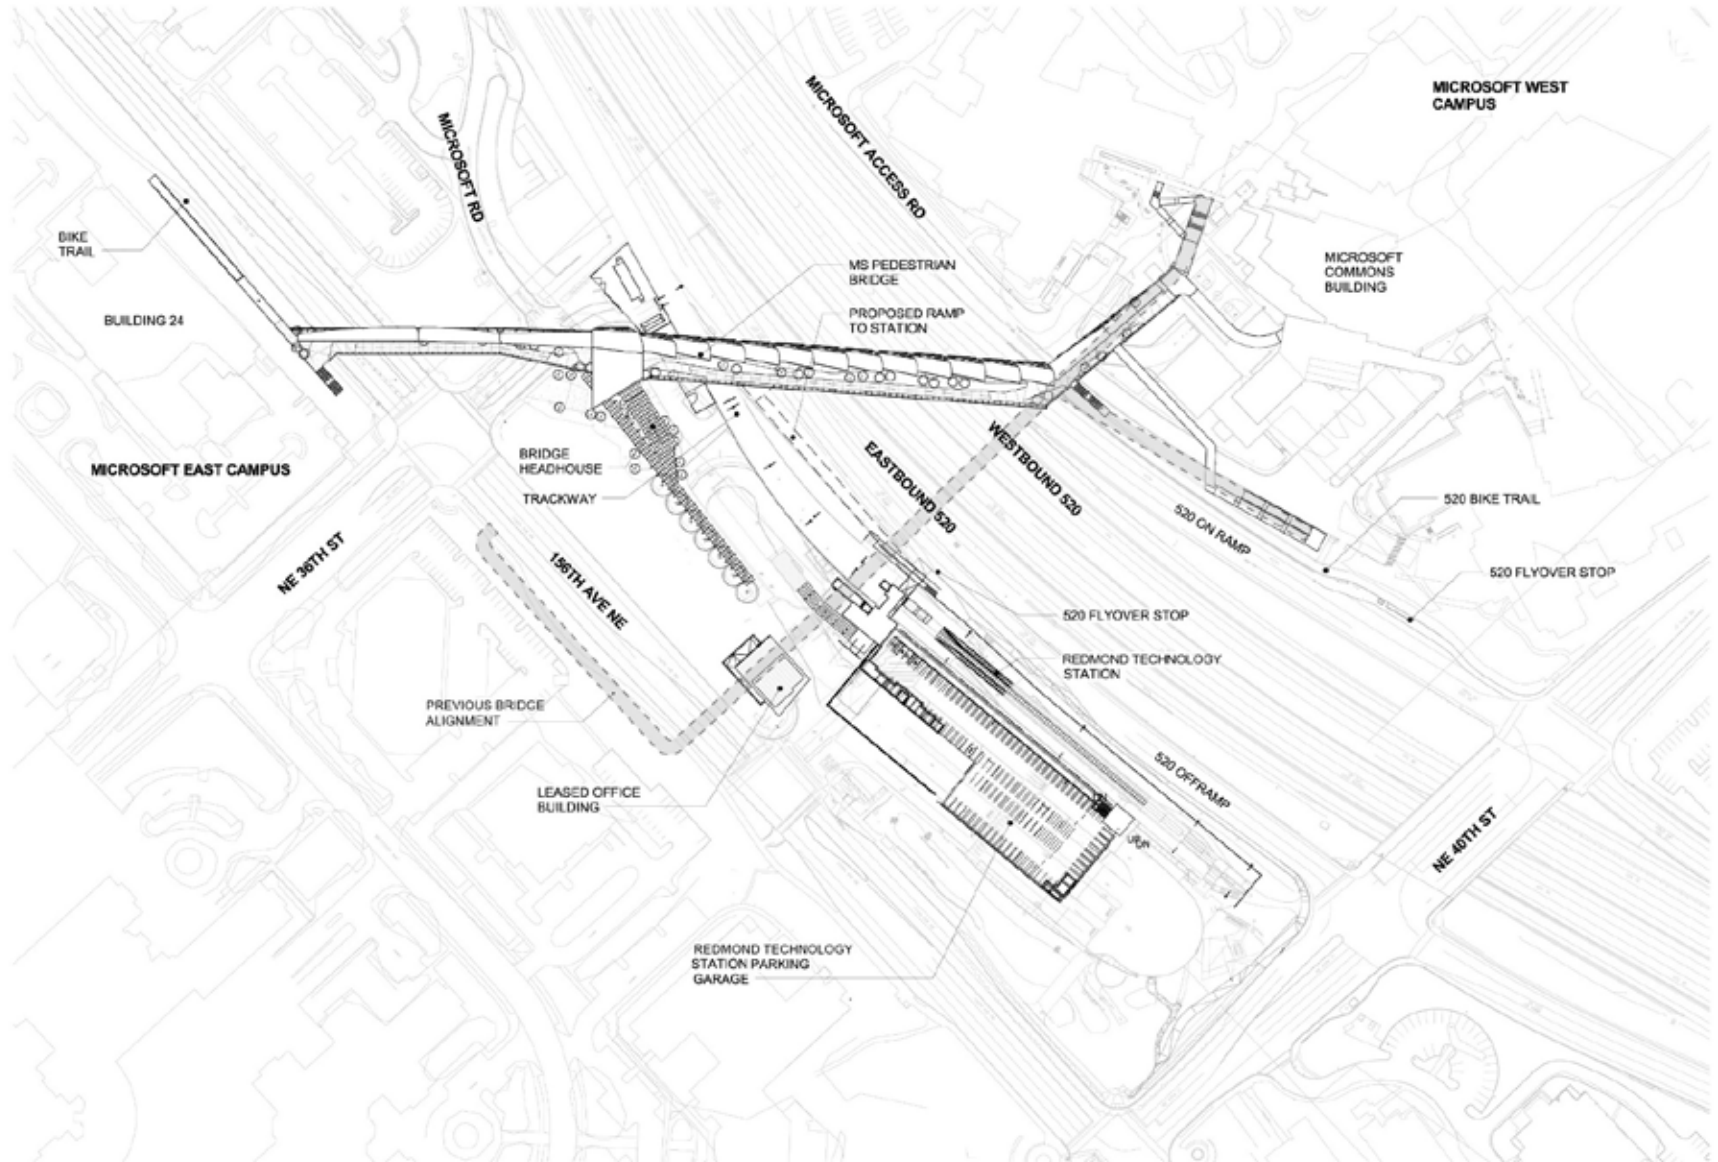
Proposed Pedestrian/Bicycle Bridge
